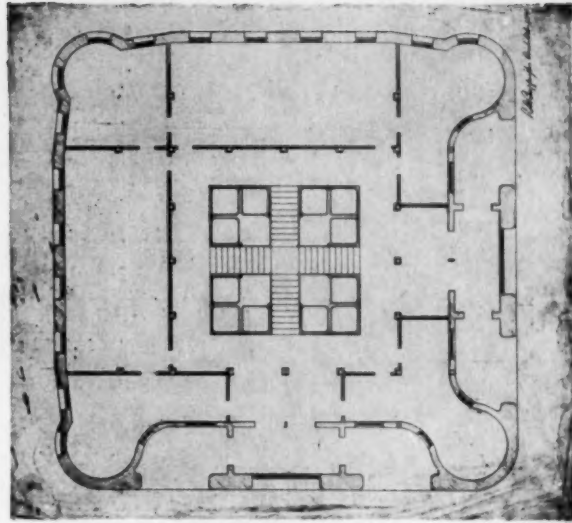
Ground Plan for 28-Story Building, Dated 1882
